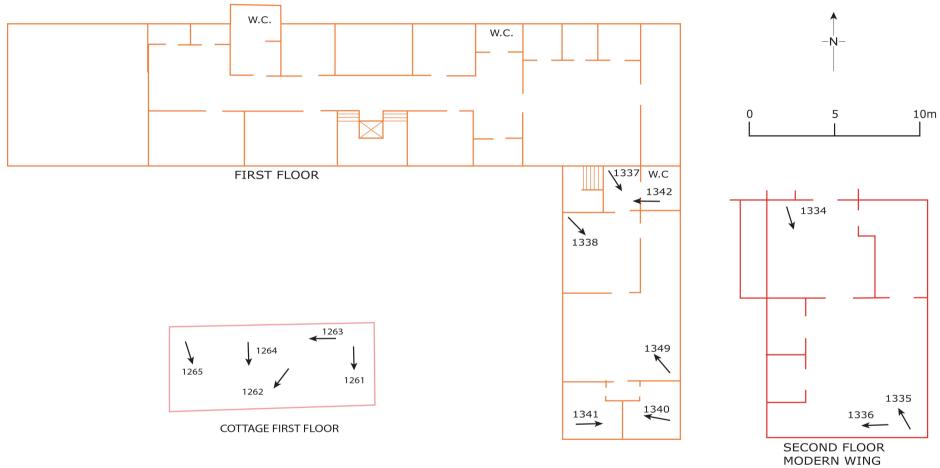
Photographic numbers, first and second floors. Schematic modern layout
